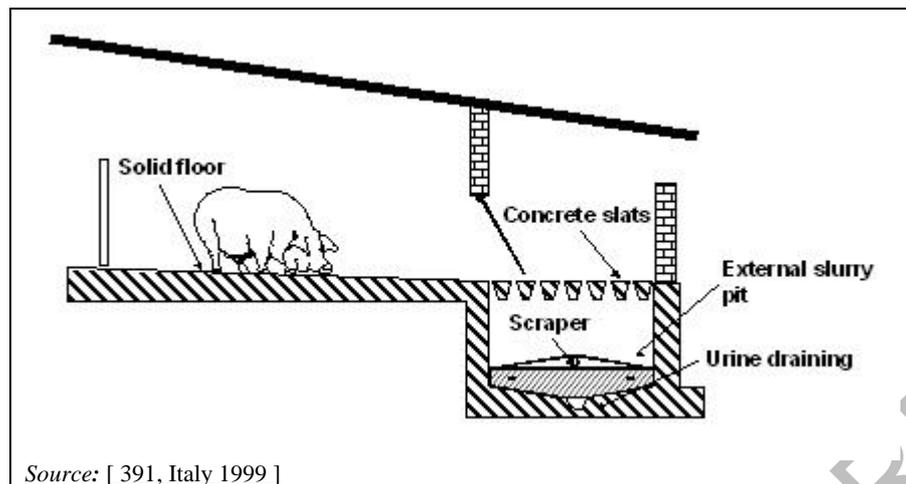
Solid concrete floor with slatted external alley and scraper underneath
